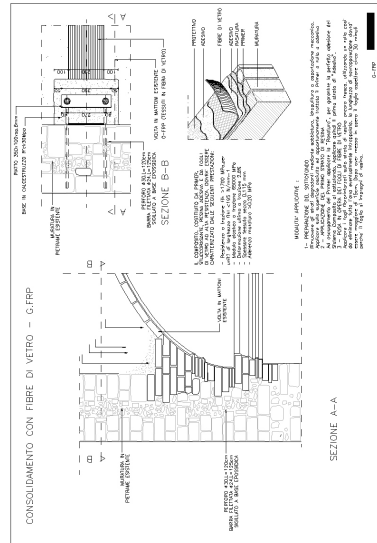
Detail illustrating the carbon fiber strip reinforcement of a typical arched opening. The carbon fiber strips are added to resist the outward
